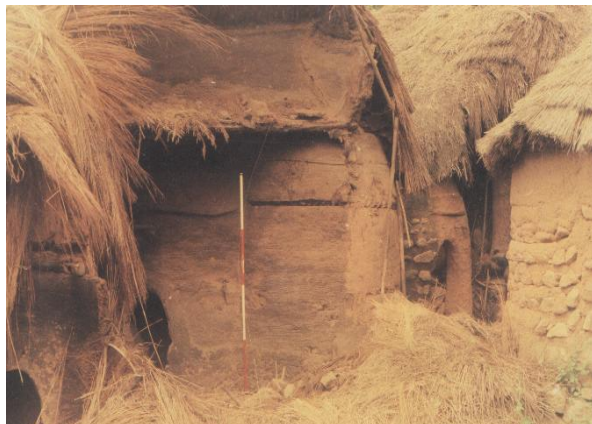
A similar structure to the one seen on plate 4 collapsed and the inner structure of such a house can thus be seen.
